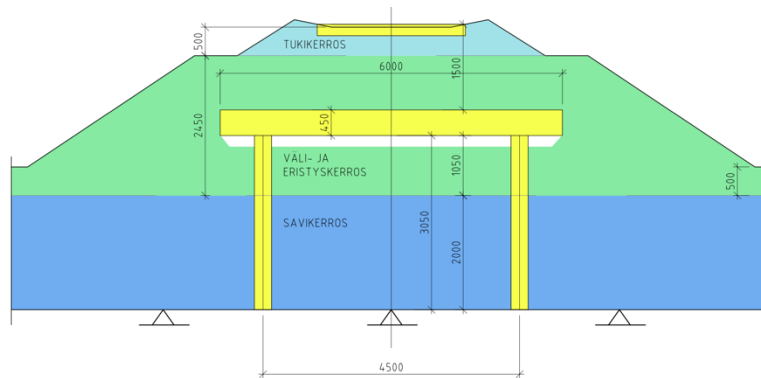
Cross section of the model with only piled slab and short 3 m long piles.
